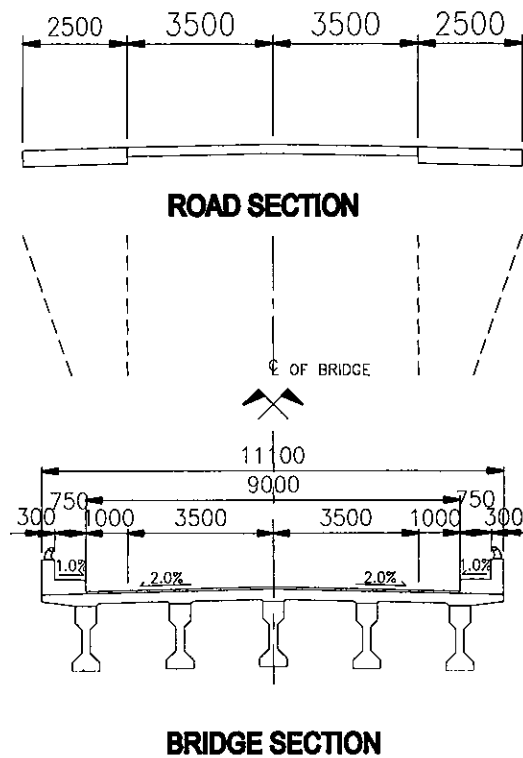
TYPICAL BRIDGE SECTION
